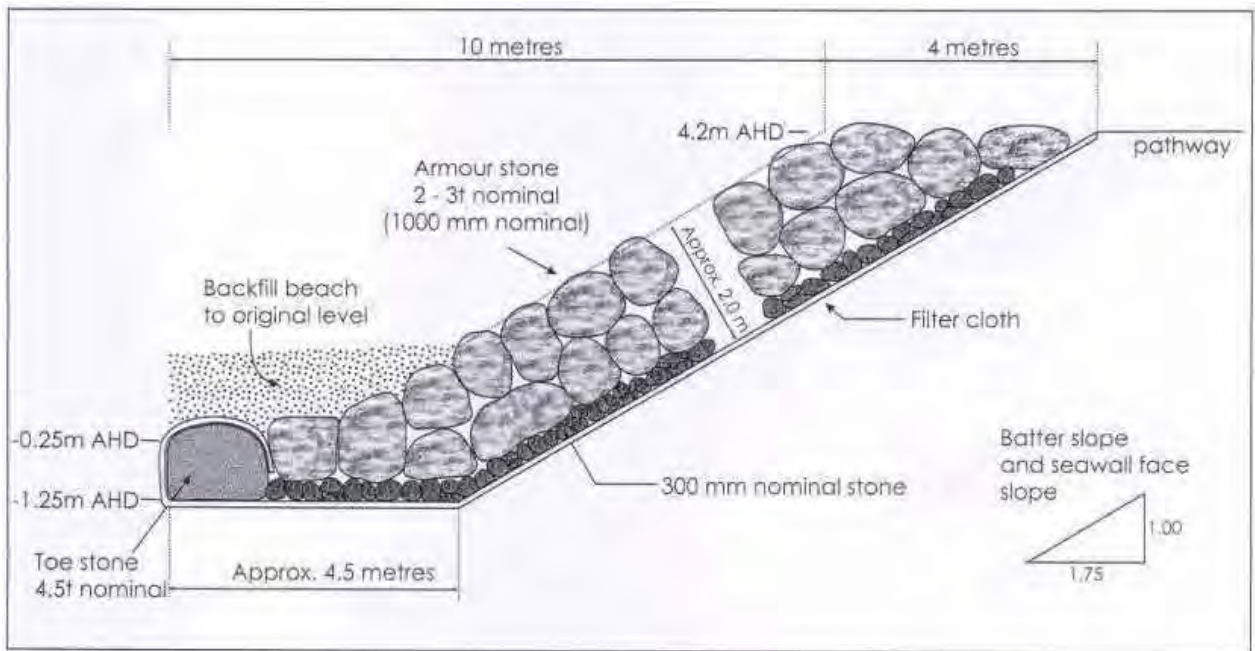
Standard Design for rock revetment seawall on the Metropolitan Adelaide Coast (CPB, 2011)
